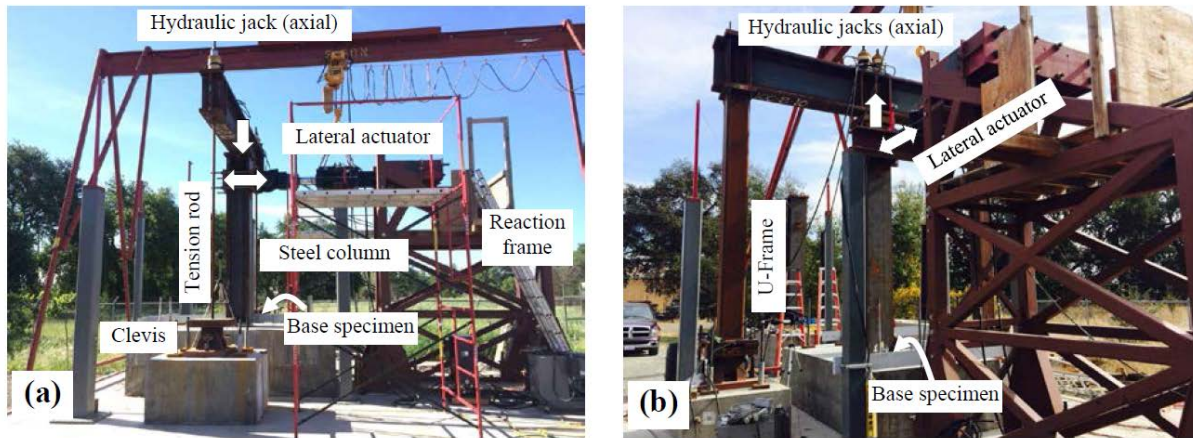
Test setup for (a) specimens with axial compression and (b) specimens with axial tension
